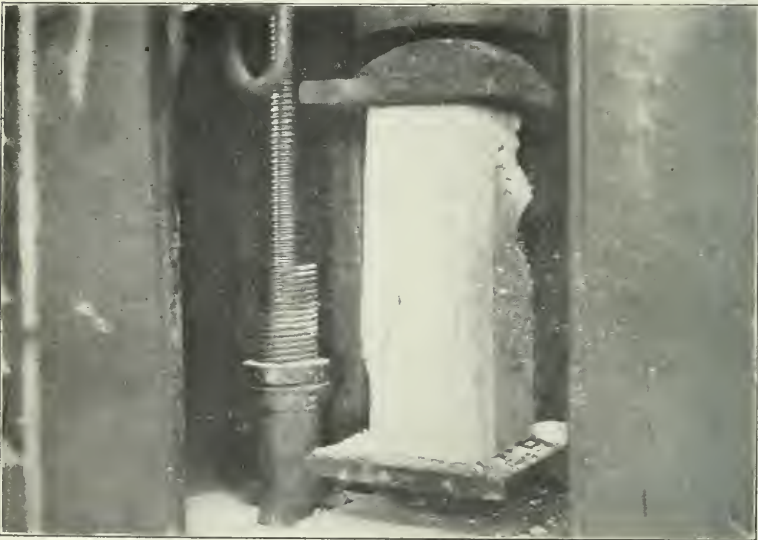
CONCRETE PRISM, AS SUBJECTED TO REPEATED LOADINGS.
